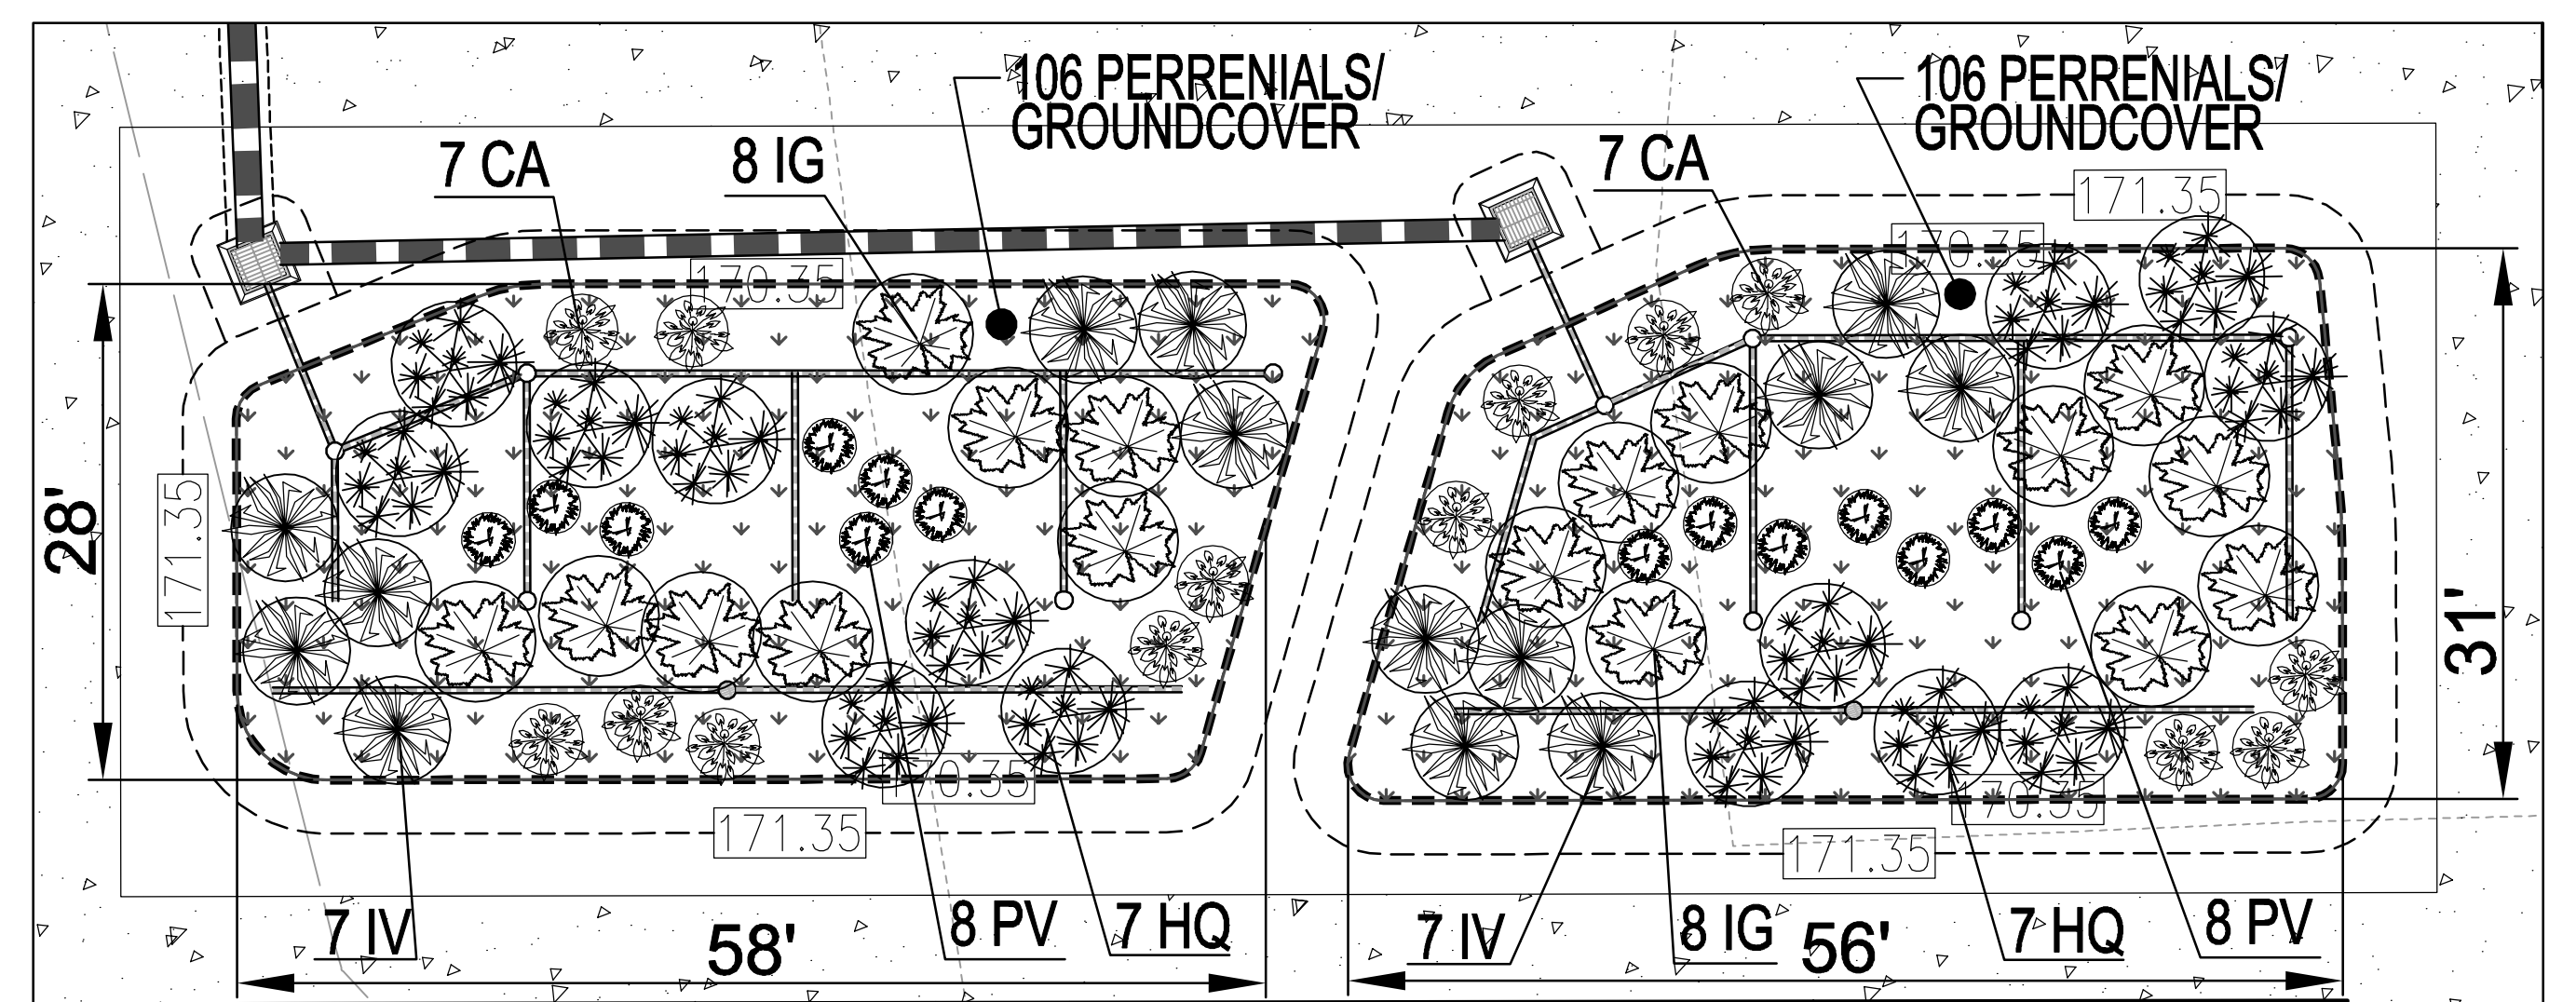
DETAILED BIO AND PLANTING PLAN (SWM #2)
